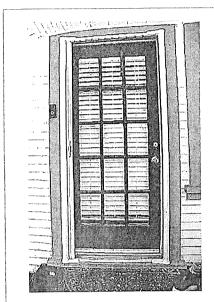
\_2552 View: Front entry door Photo Date: July, 2020 Camera Facing: WSW
